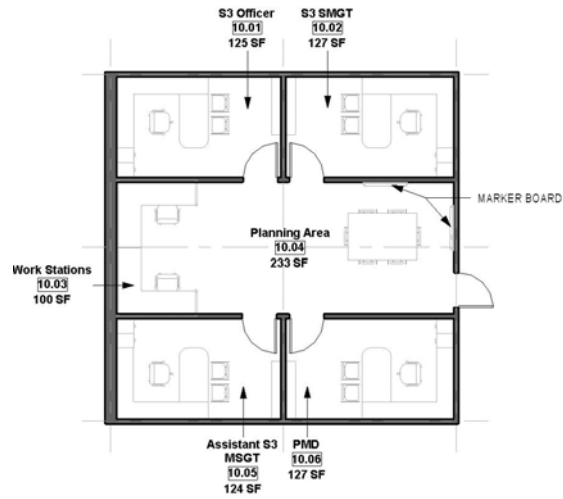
Module 10: Operations & Training/ S3 – Floor Plan
